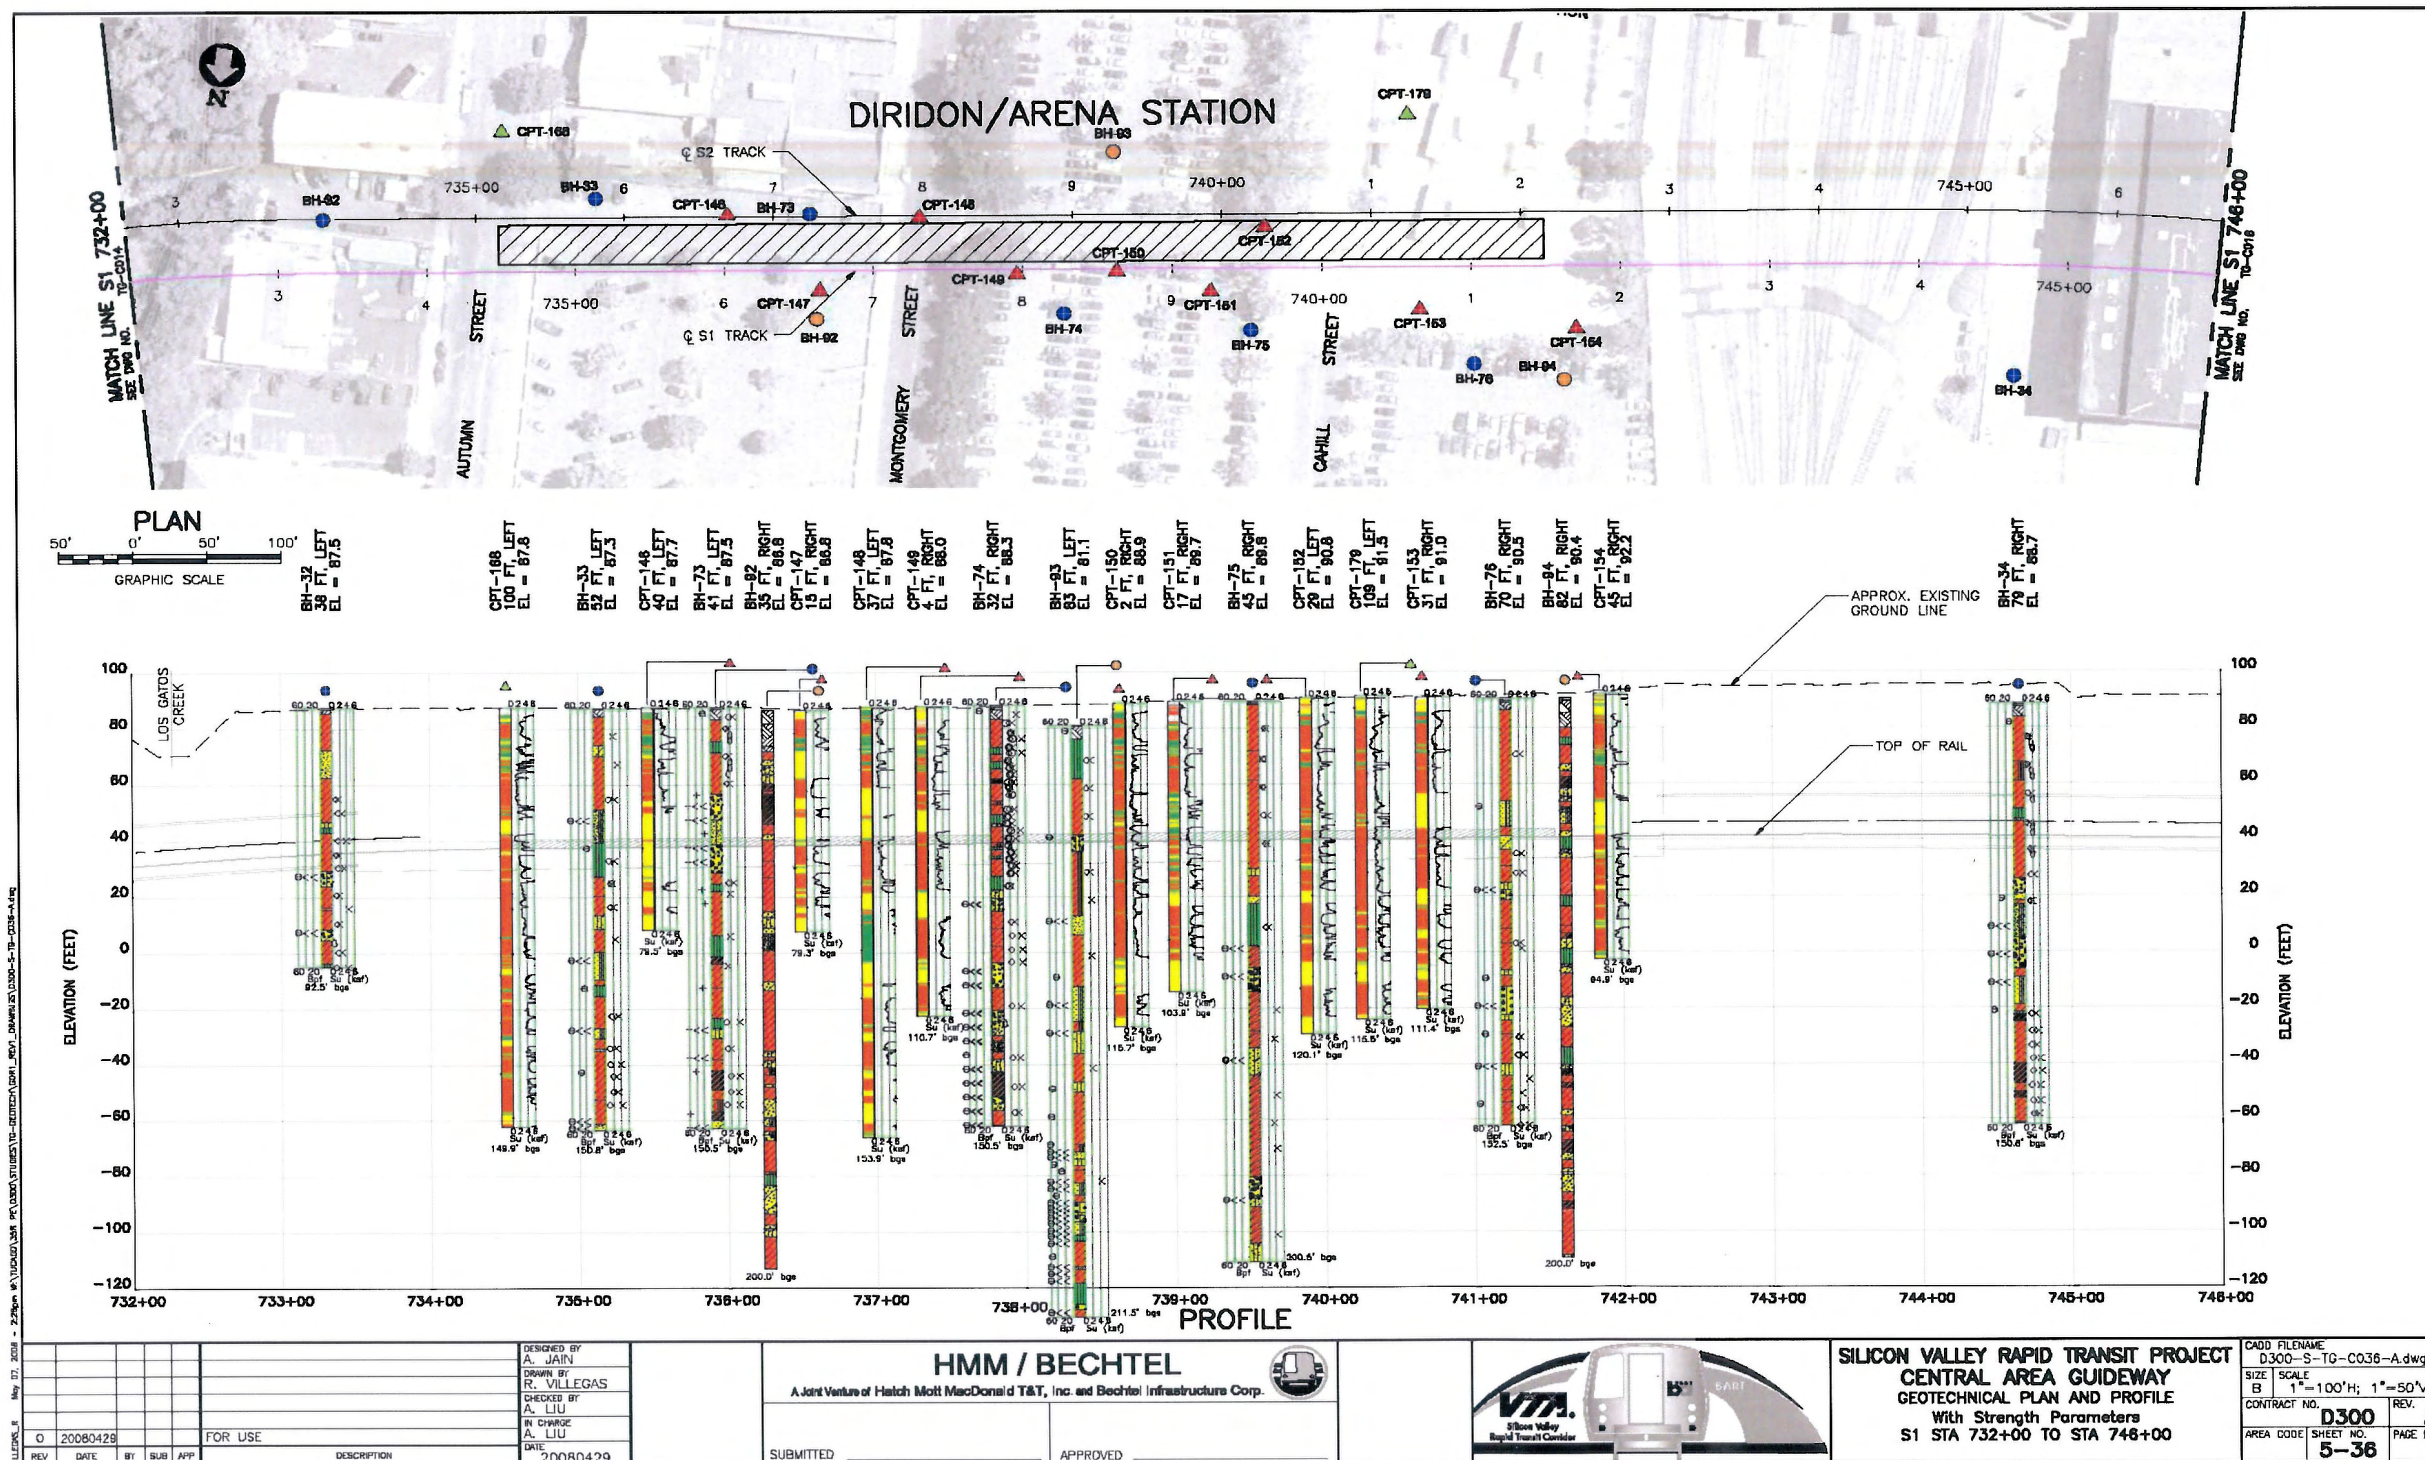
Geotechnical Plan and Profile with Strength Parameters at Diridon/Arena Vicinity (from HMM/Bechtel 2008a, Not to Scale)
